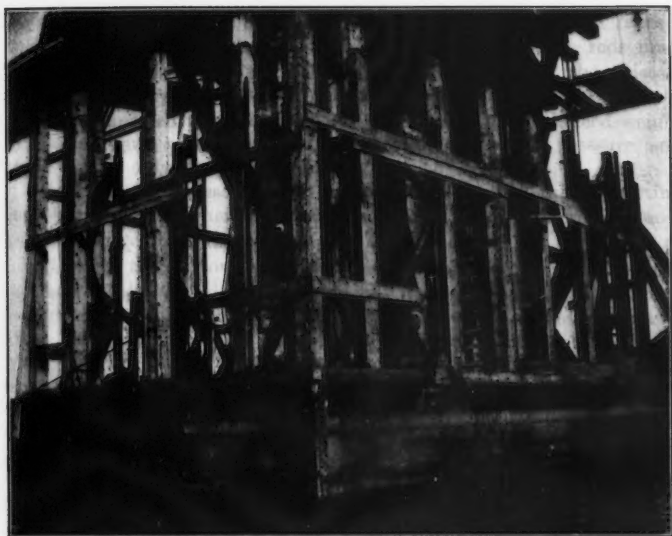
LOWERING COFFER-DAM AROUND PIER 3.
